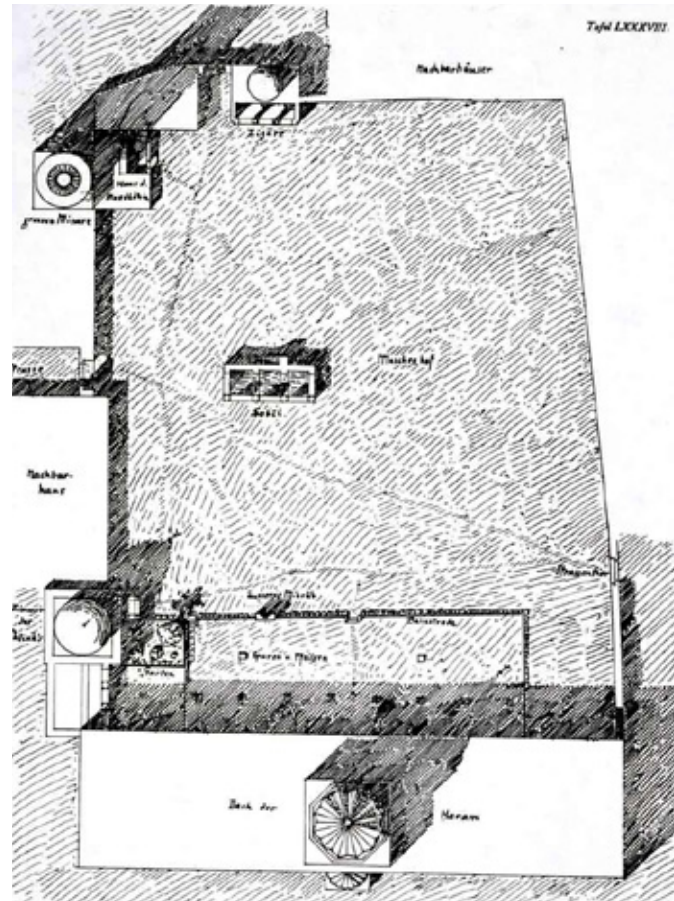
Layout plan of Al Nouri Mosque Complex and layout plan of the Prayer Hall at the beginning of the 20th century, 1920.
